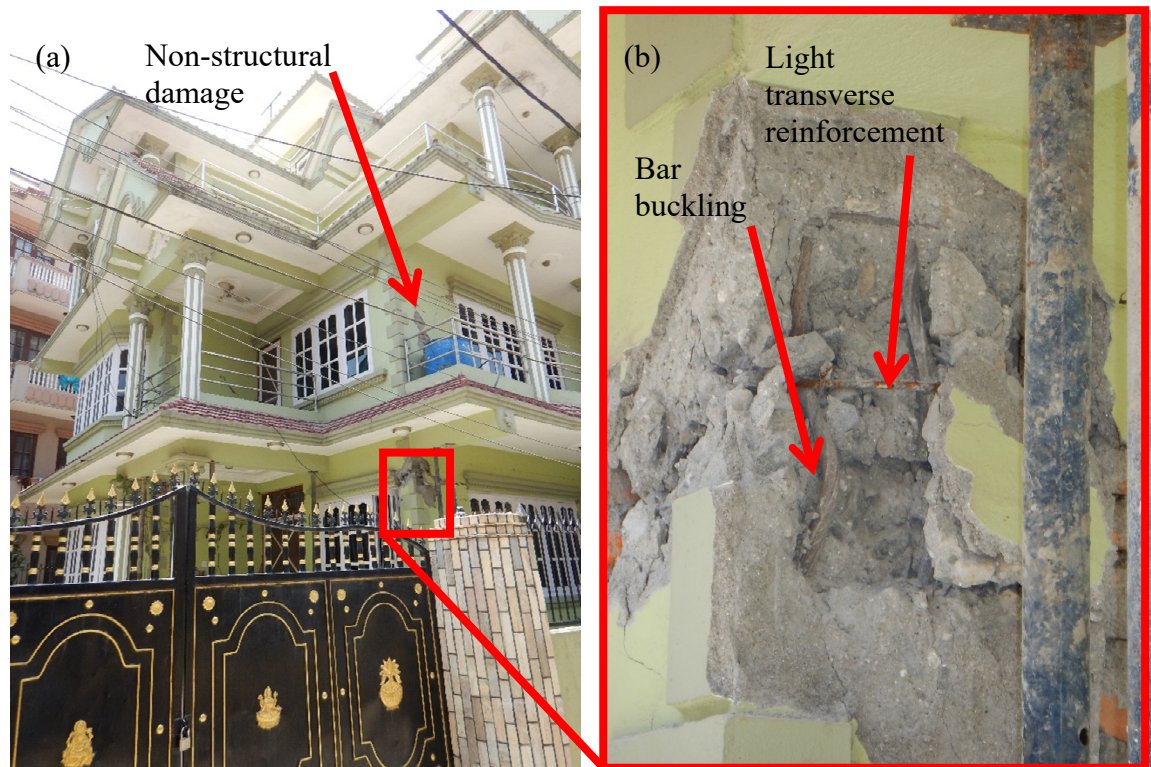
RC frame building with significant damage, but no collapse; Balaju, Kathmandu: (a) overall view; (b) beam-column joint failure.
